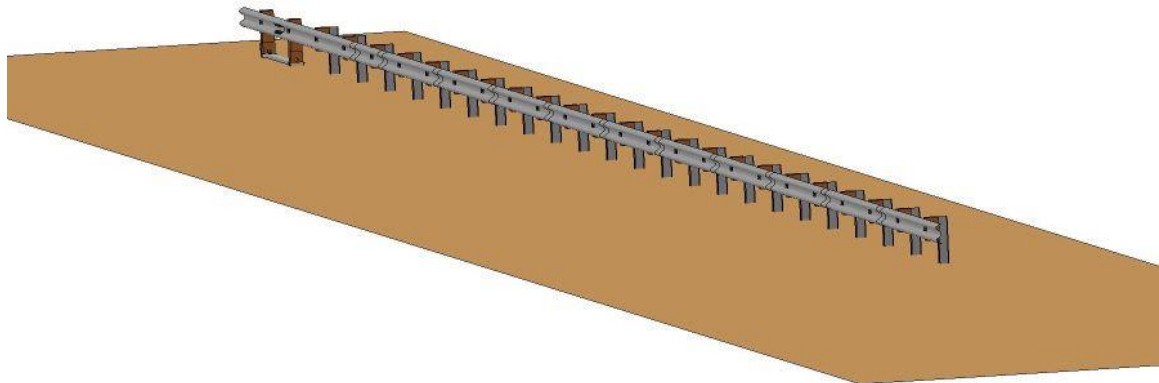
Modified G4(1S)Guardrail System with Downstream Anchorage Removed
